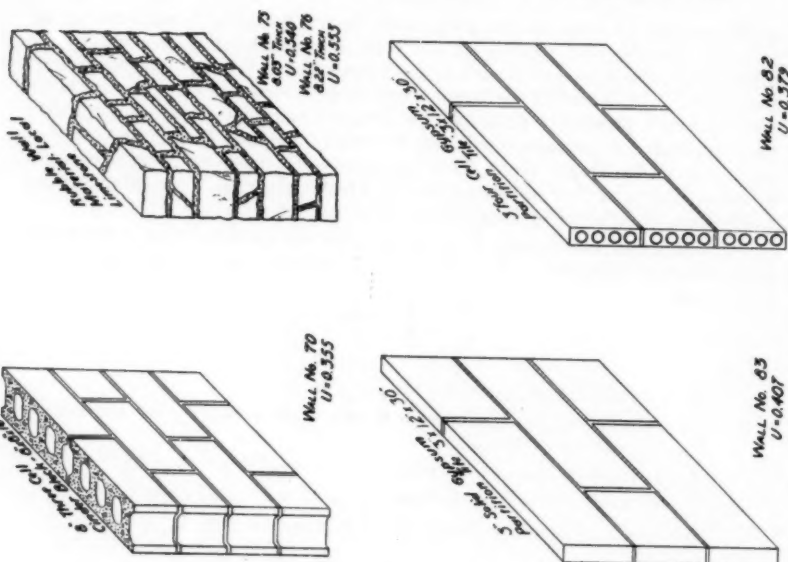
SECTIONAL VIEWS OF TEST WALLS NOS. 70, 75, 76.
